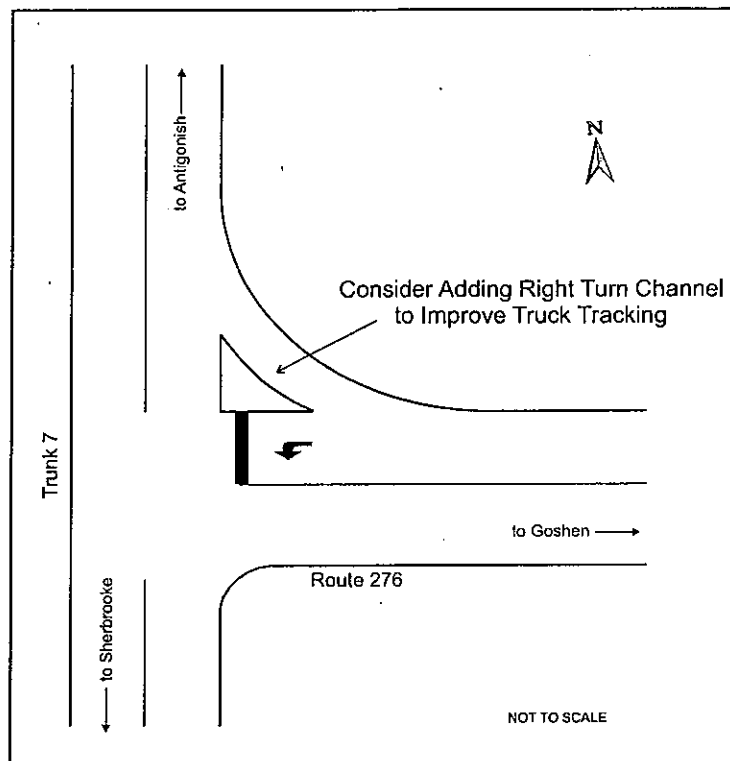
Intersection Improvement - Trunk 7 at Route 276
